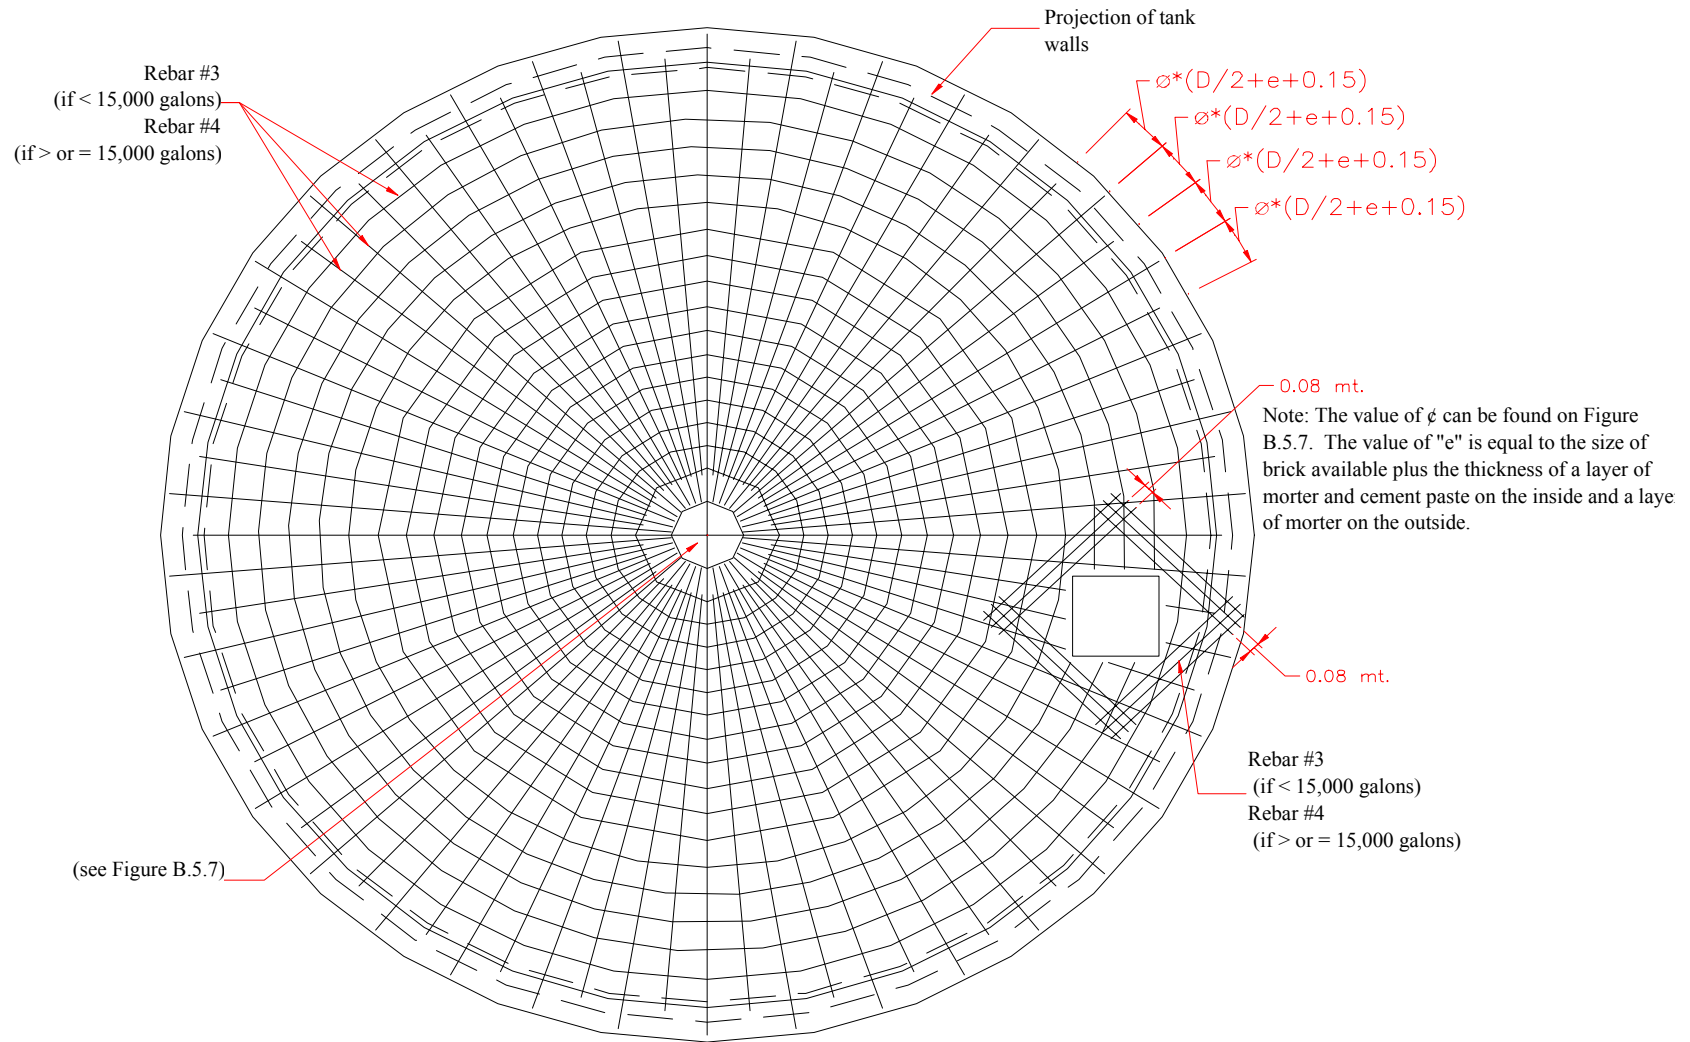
Plan view cross section of storage tank with details on plumbing.
